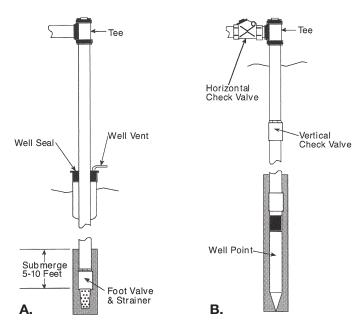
Shallow well installation. Drilled, bored or dug wells shown in A. Driven wells and sandpoints employ the configuration in B. © *ITT Goulds Pumps.
